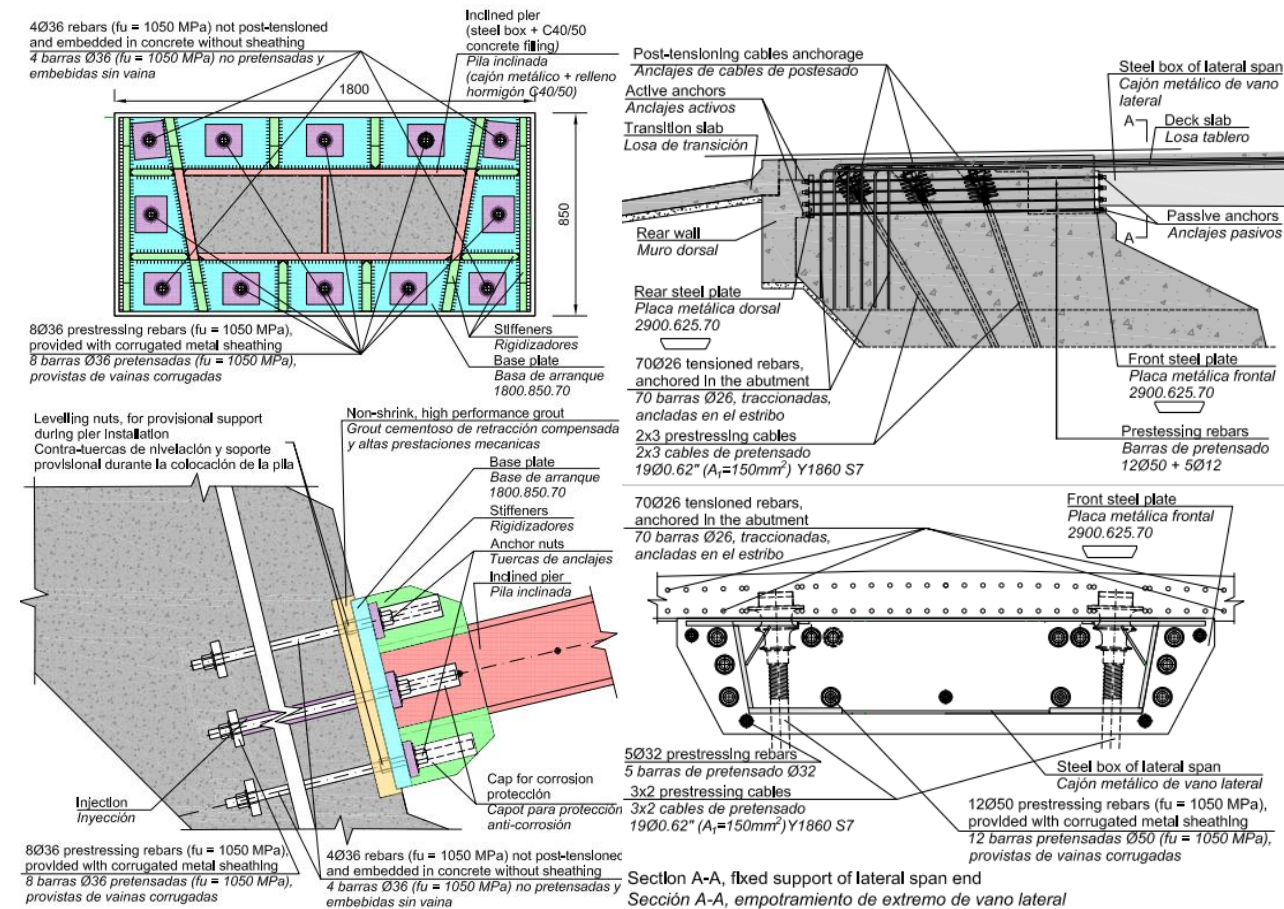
Pier base connection to the abutment (left) and lateral span deck connection to the abutment (right)
